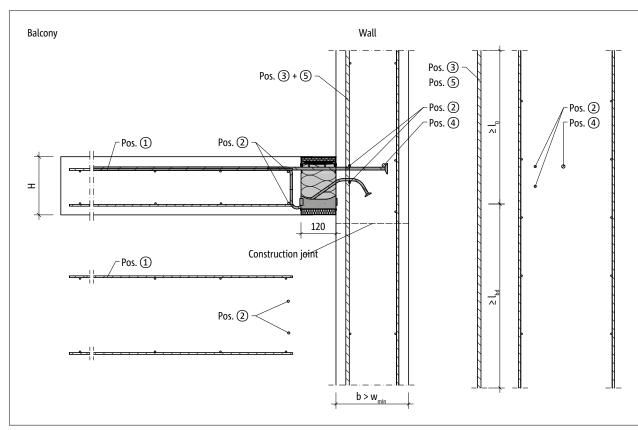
Schöck Isokorb® XT type K-U: On-site reinforcement for wall connection upwards with larger structural element dimension (w_{varh} > w_{min})
